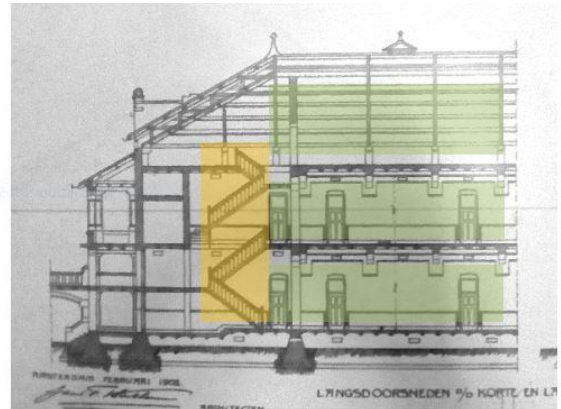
(Right) Schematic Space and Void Layers on the longitudinal section of the Wing Ladder Area: North of the building A Lawang Sewu, 1916
